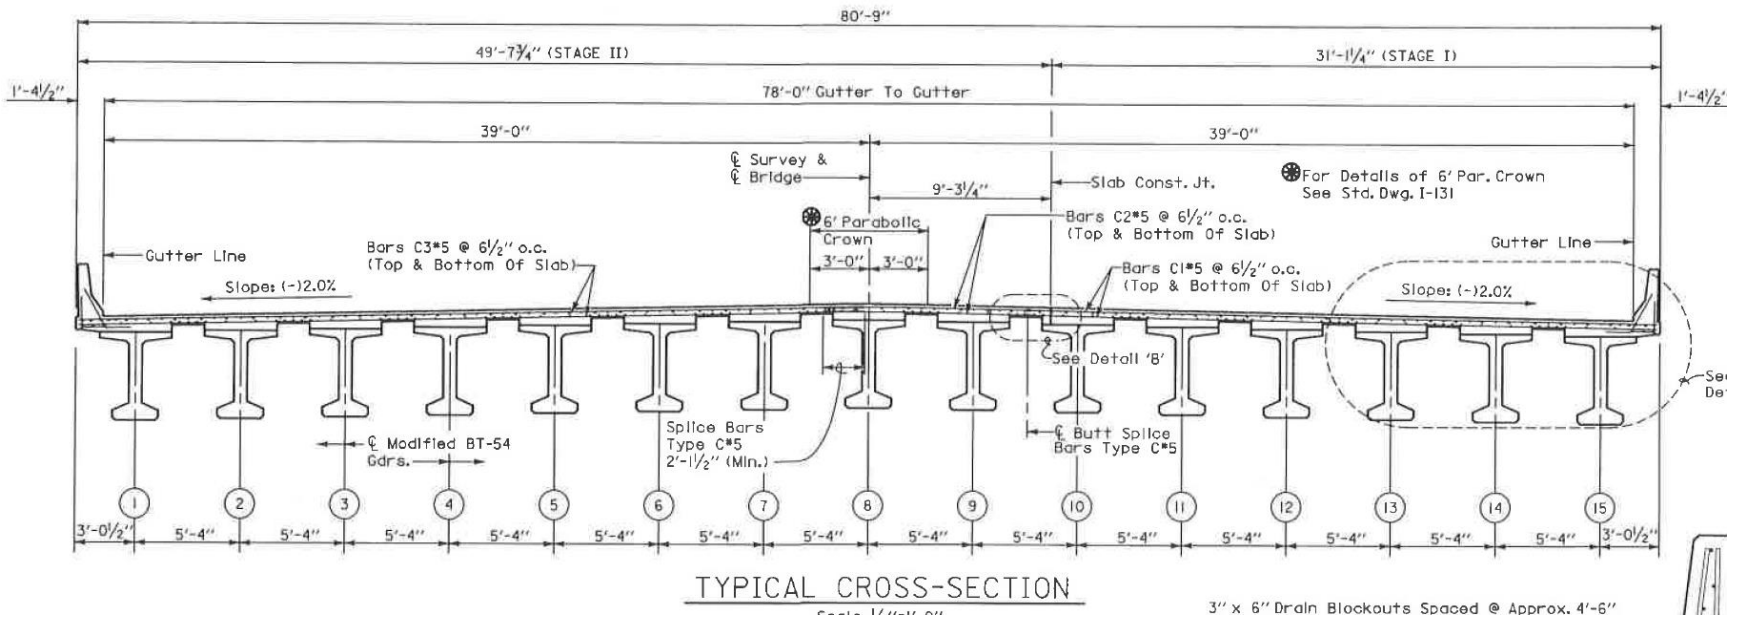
Lee County typical bridge deck cross section (ALDOT 2006)
